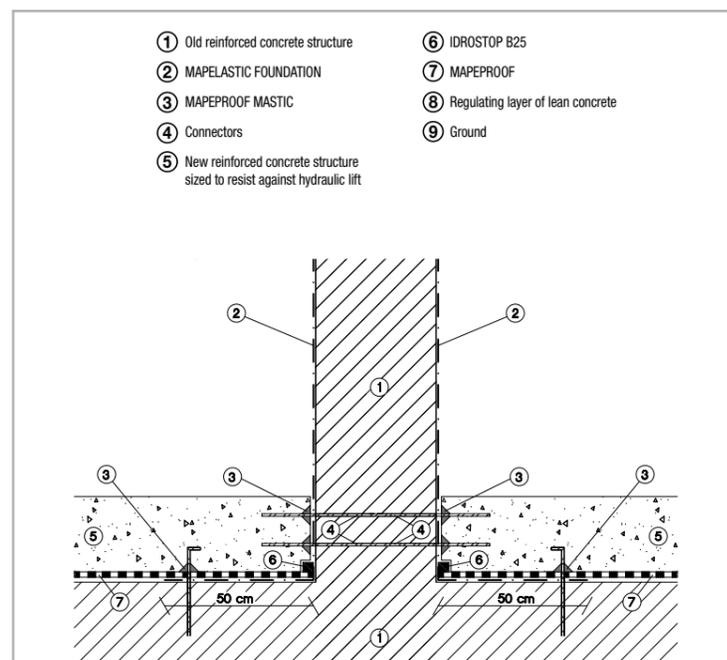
Detailed layout of relining the inside of a room by applying MAPEPROOF on the horizontal surfaces and MAPELASTIC FOUNDATION on the vertical surfaces: fillet joint between the floor slab and a pillar or parting wall
